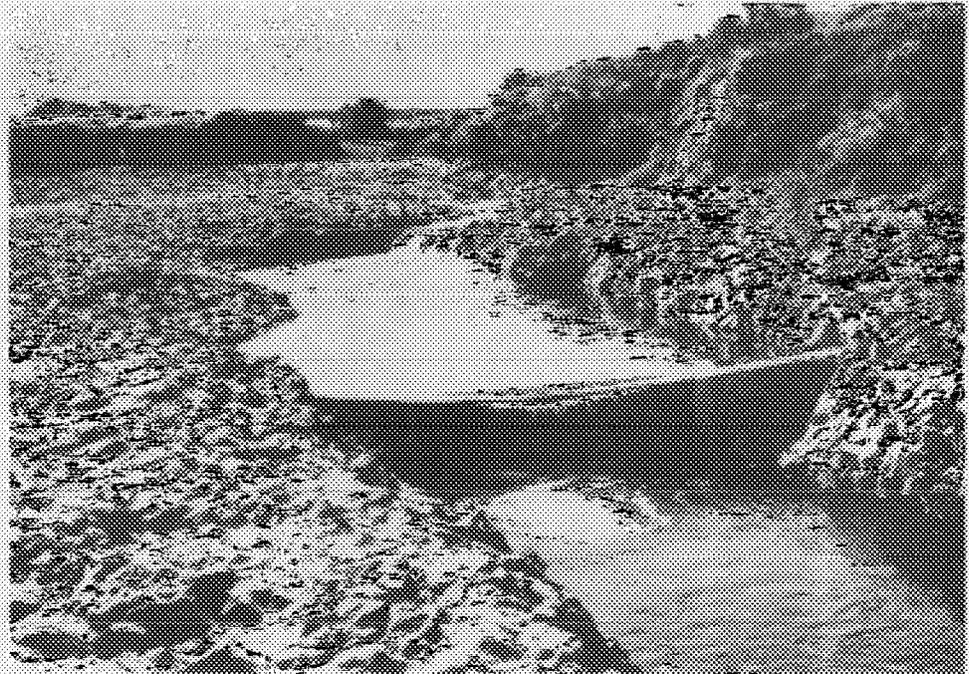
WEIR NO. 2 AS CONSTRUCTED
